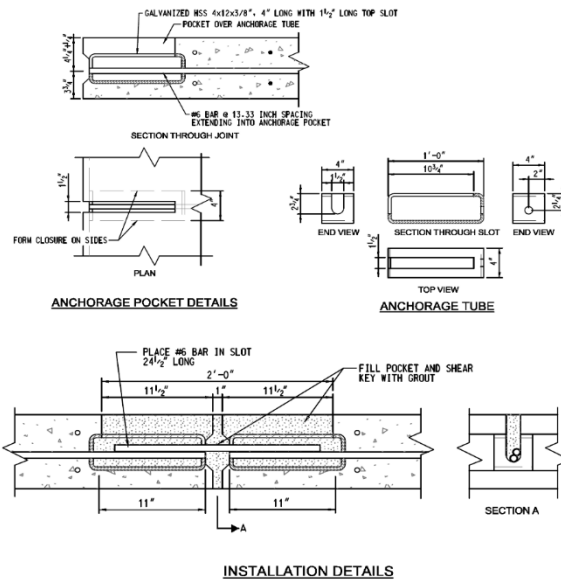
Deck-to-deck connection detail developed in NCHRP 584 (Badie and Tadros 2008) and used in Texas in 2008.
